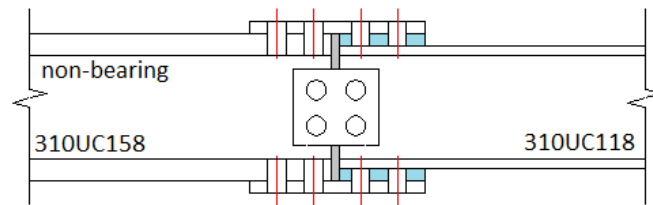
Schematic view of Specimen #5, (Non-bearing with 10mm gap, 6mm fillers, 12mm flange plates)
